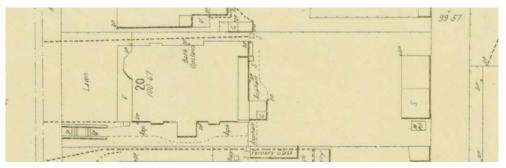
MMBW Detail Plan no. 980, dated 1900 (source: SLV).
